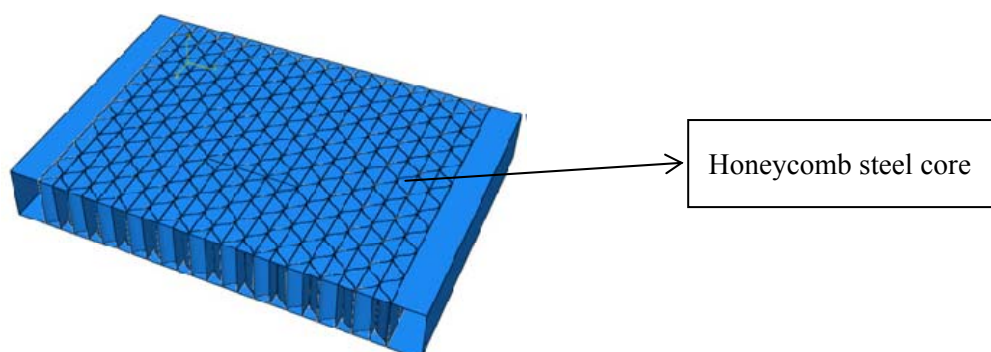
Sandwich deck system with steel core (Lombardi & Liu, 2011)
